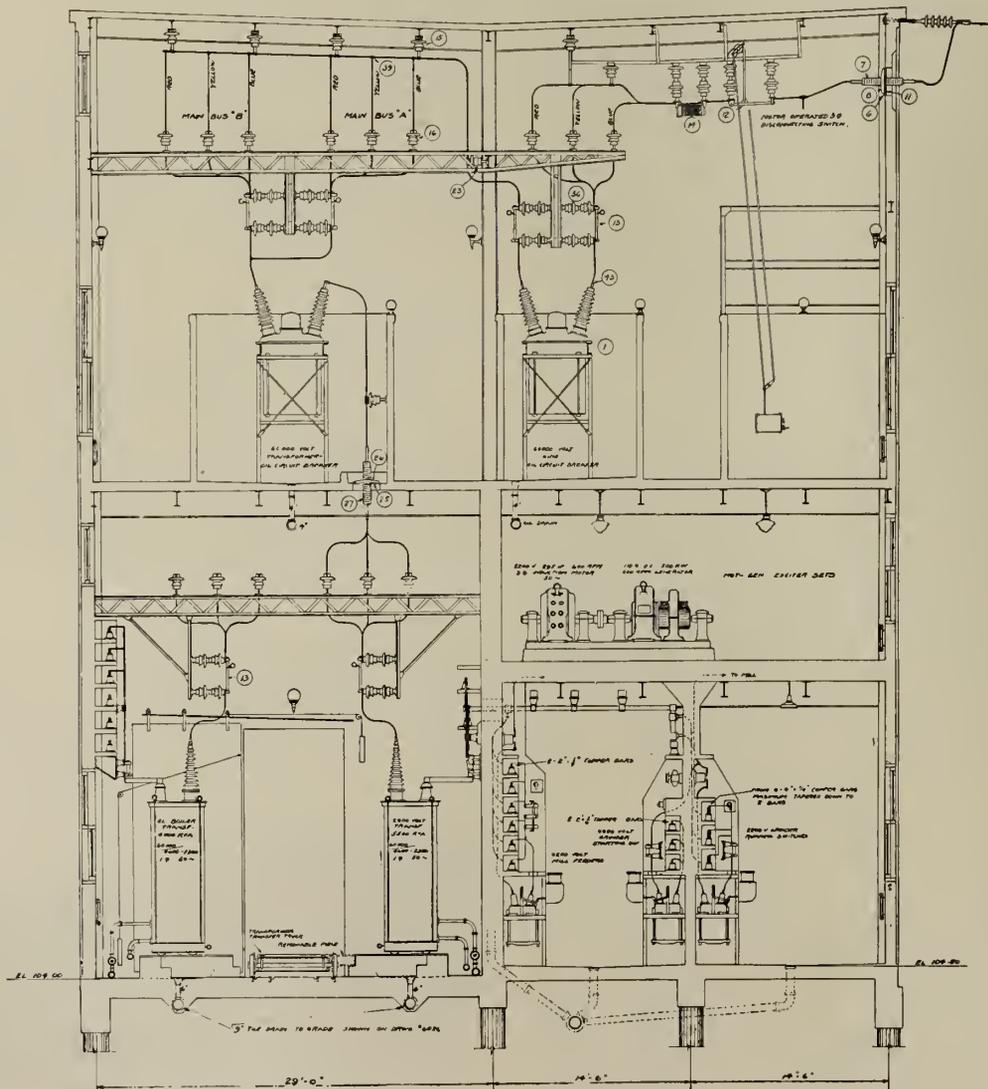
Cross Diagram of Substation, Section A-A.
